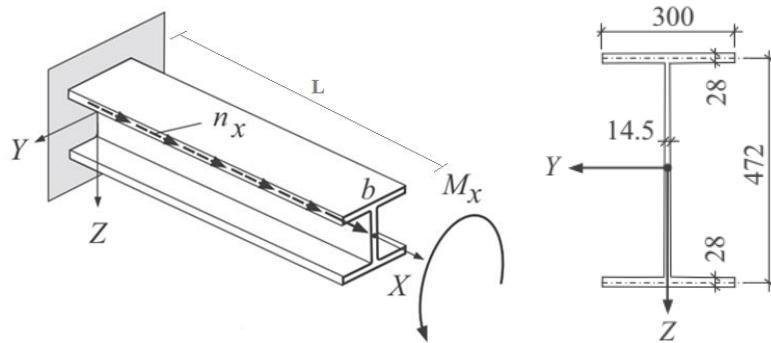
(Left) cantilever I-beam and (Right) I cross-section dimensions in mm [22] (Modified)
